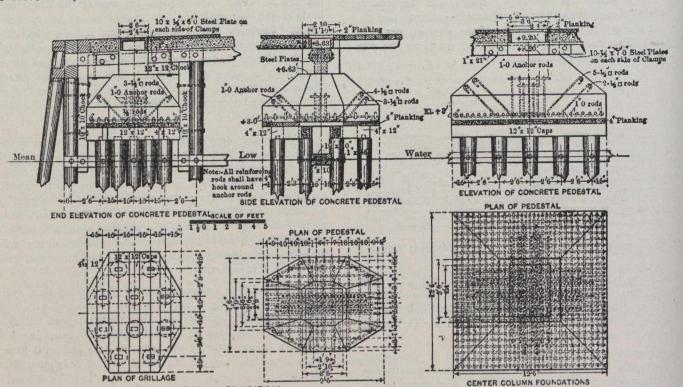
Details of Reinforced Concrete Deck and Column Pedestals, Two-Story Shed.
